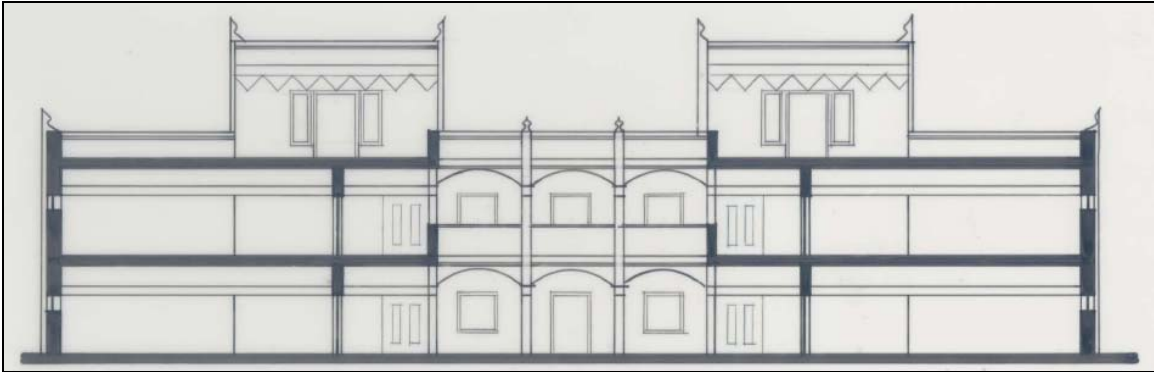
Transverse Building Section (A-A). The section shows how each space connects to the central courtyard.
